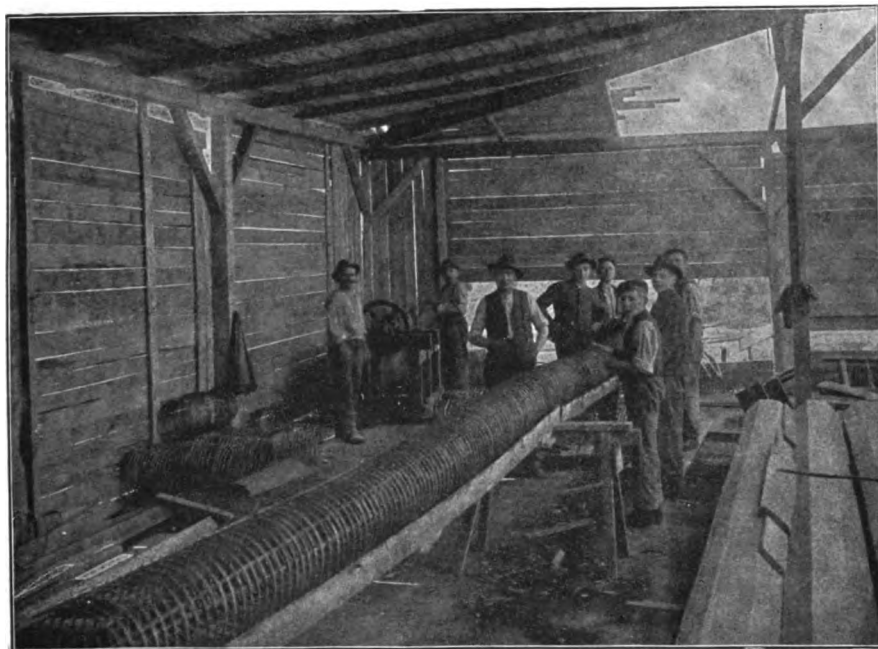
Factory in Metz. Fabrication of pile reinforcement.
